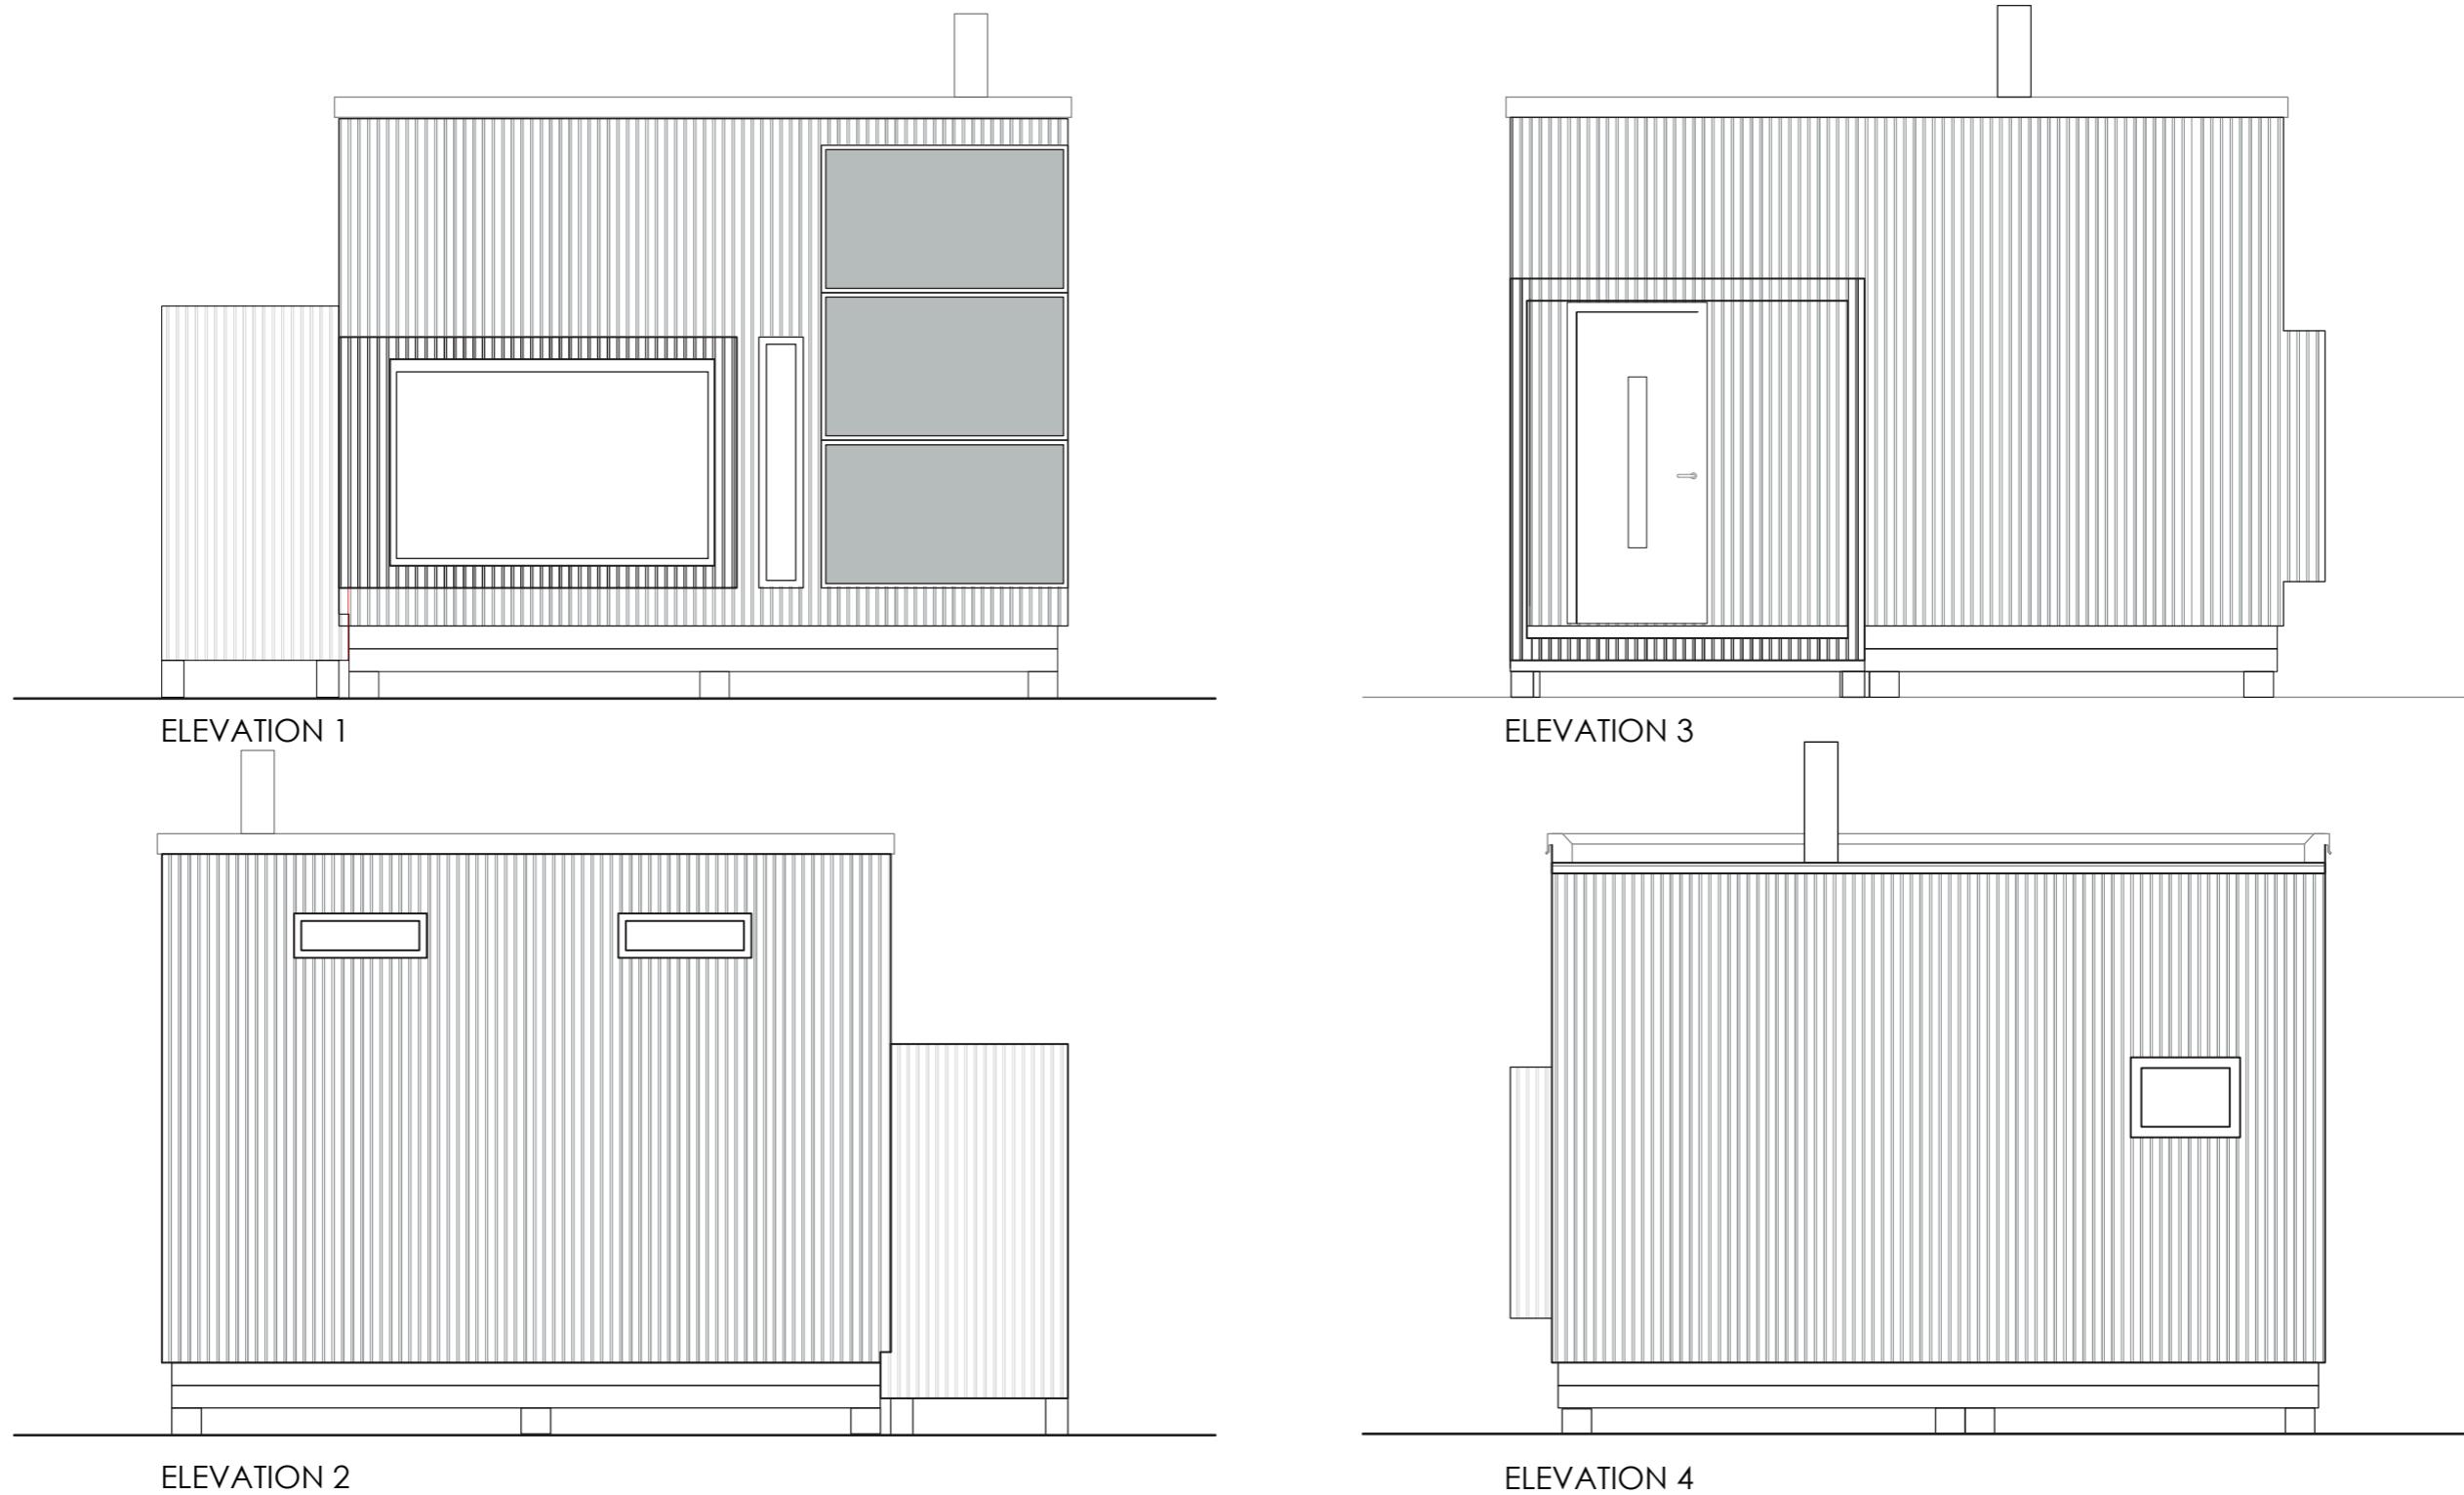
Facade Elevations SC 1:75 [AutoCAD and Illustrator]
